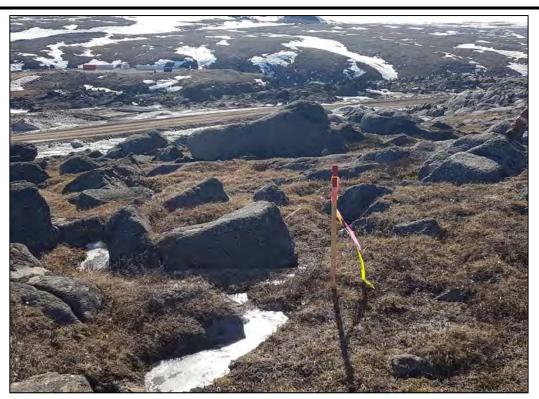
KM106-DH19-04 Looking South Before Drilling
